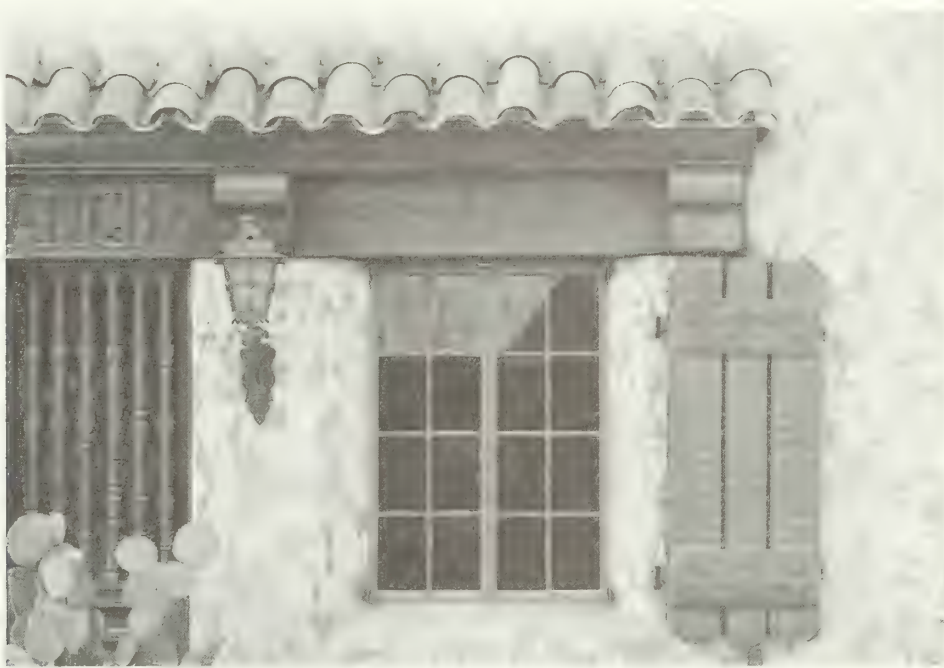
Window details, Main House. North entry showing surface tooling ("antiquing") of wood shutters. R.L. Carper, 4/90.
